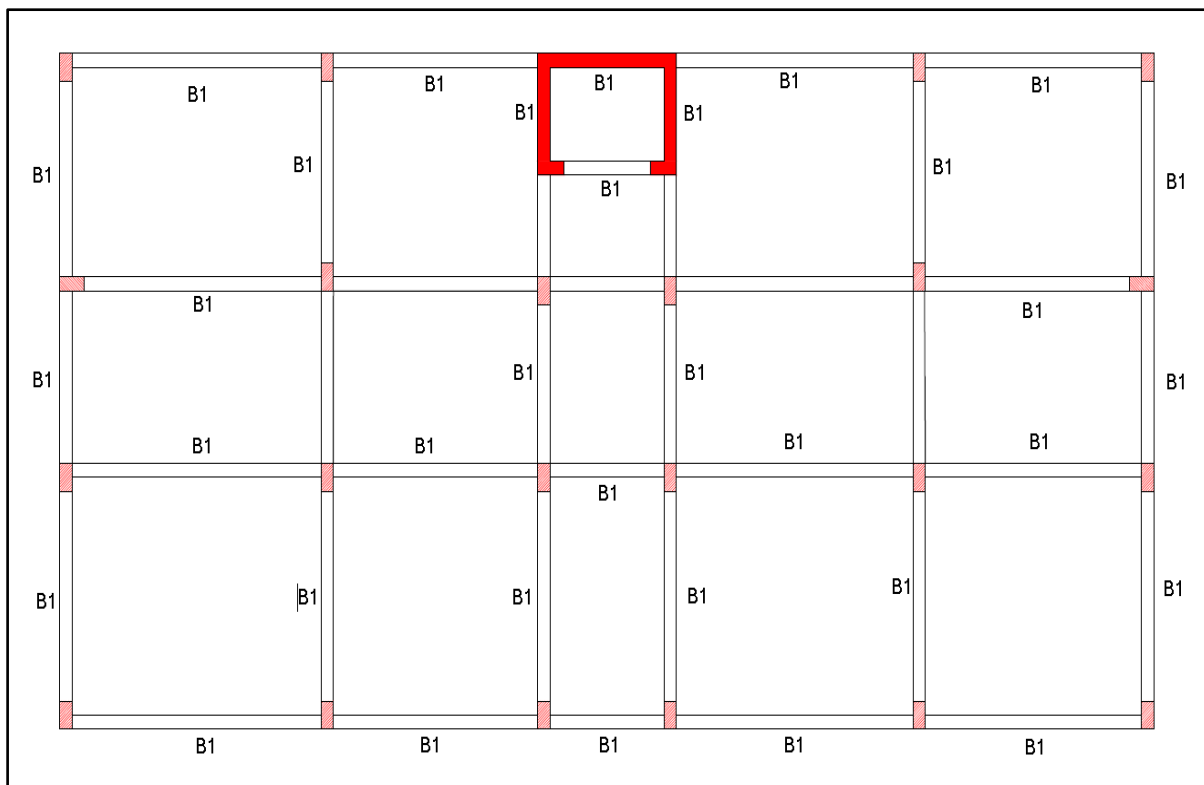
Shear Wall at Three periphery sides of lift AutoCAD Plan
